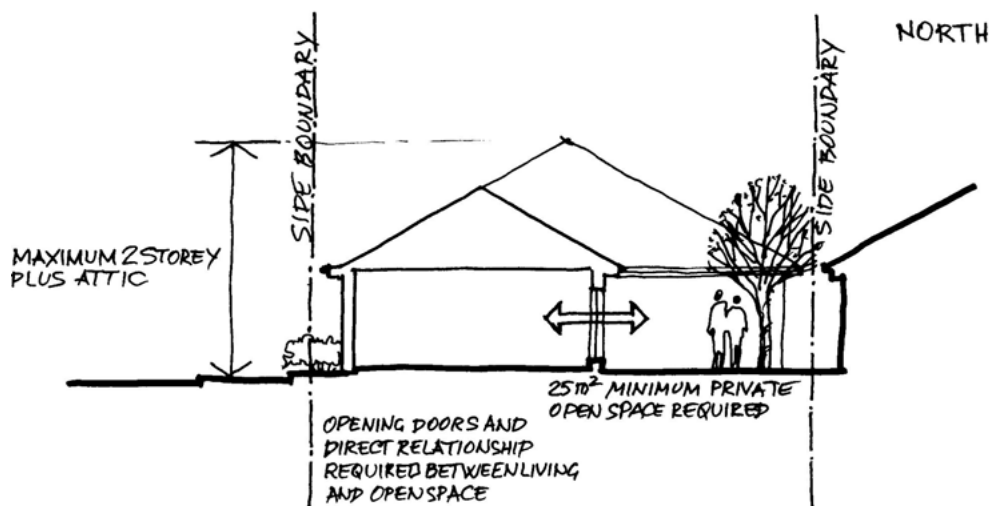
Cross section of single storey courtyard dwelling.
